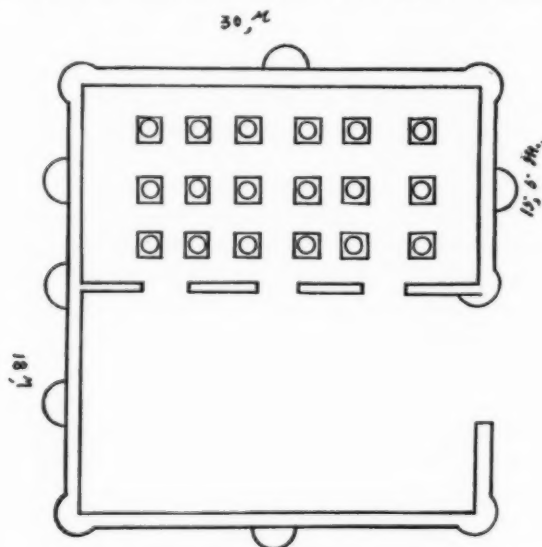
PLAN OF BRICK BUILDING WITH COLUMNS, AT ABU ADHAM.
